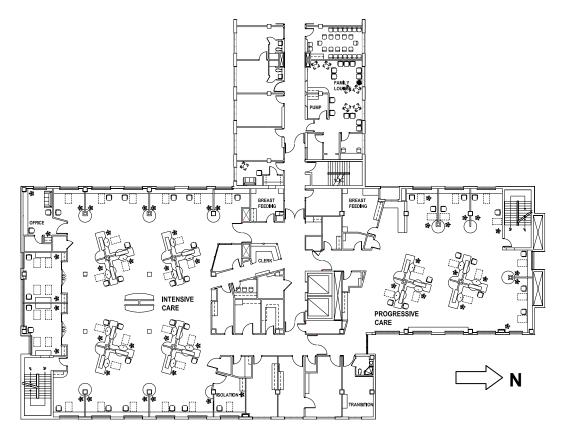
Open-bay neonatal intensive care unit #2 floor plan (not to scale).
